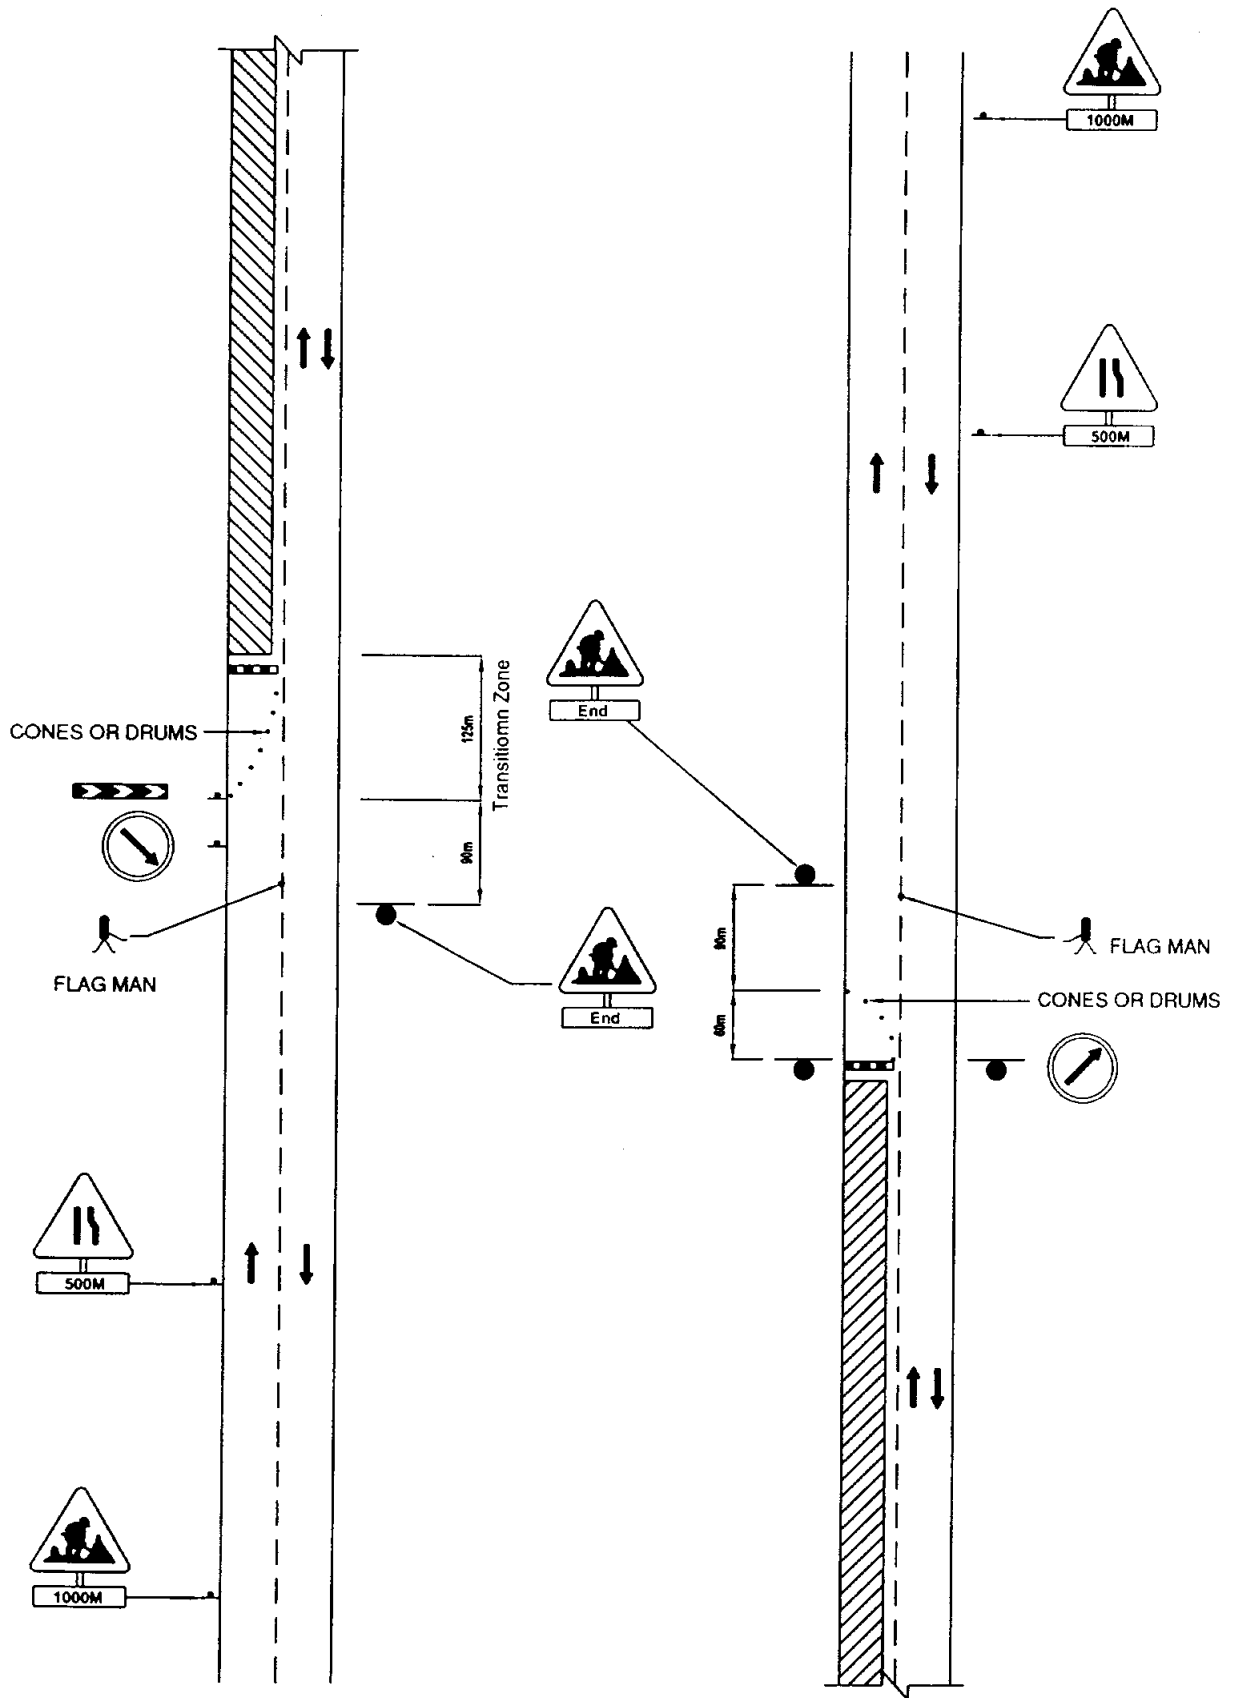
Typical Layout for a Construction Zone on the existing two Lane Carriageway
